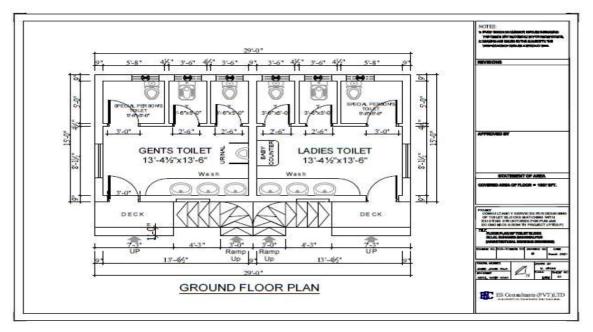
Architecture plan of proposed toilet block at Lal Suhanra
